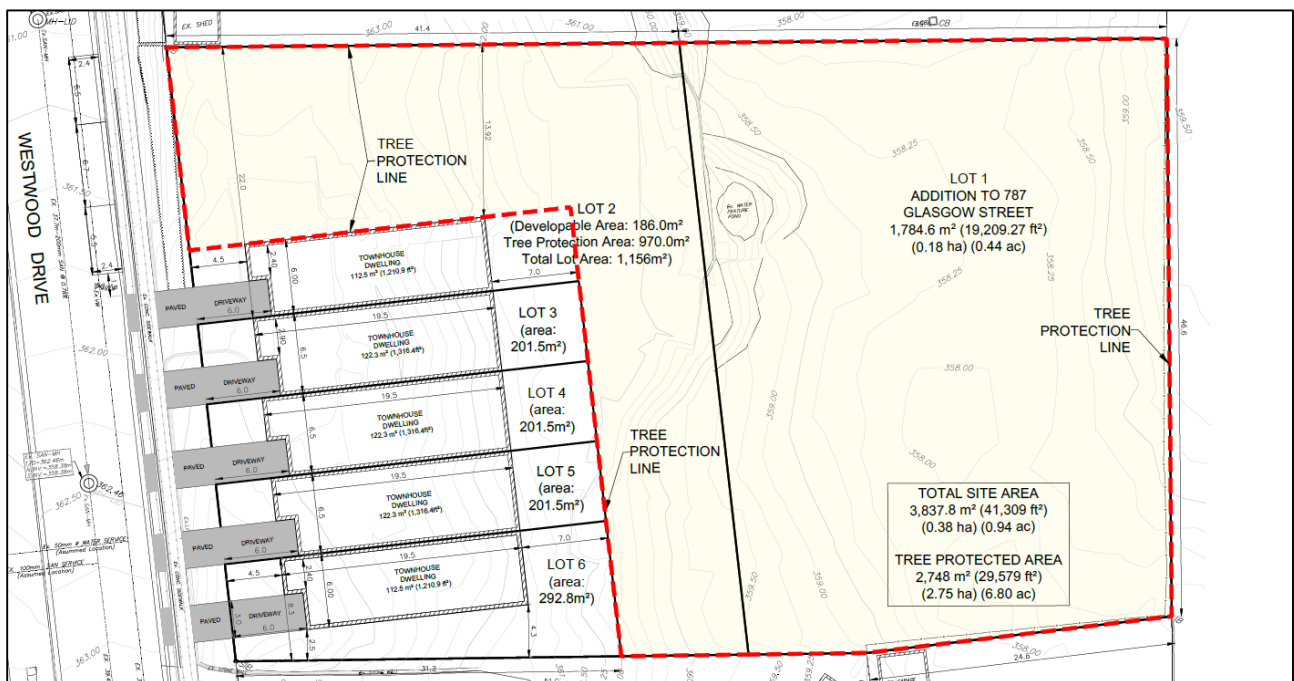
Revised Concept Plan (5 street townhouse dwellings)
